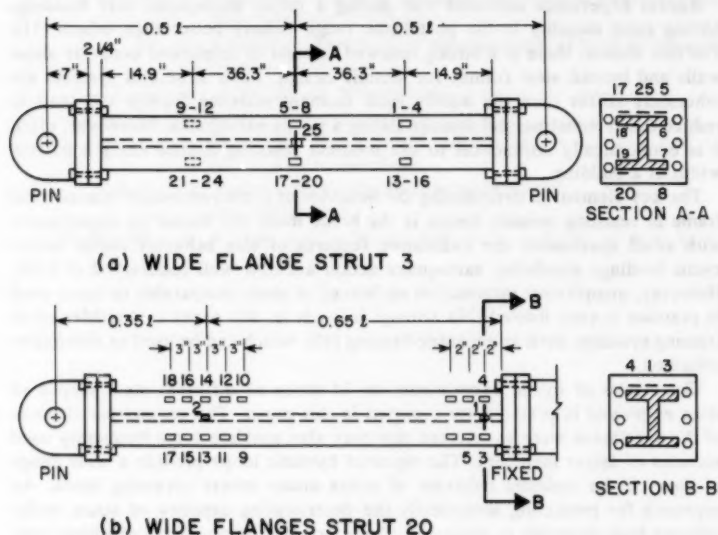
Typical Details of Specimens: (a) Pin-Ended; and (b) Pin-Fixed Ended (1 in. = 25.4 mm)
